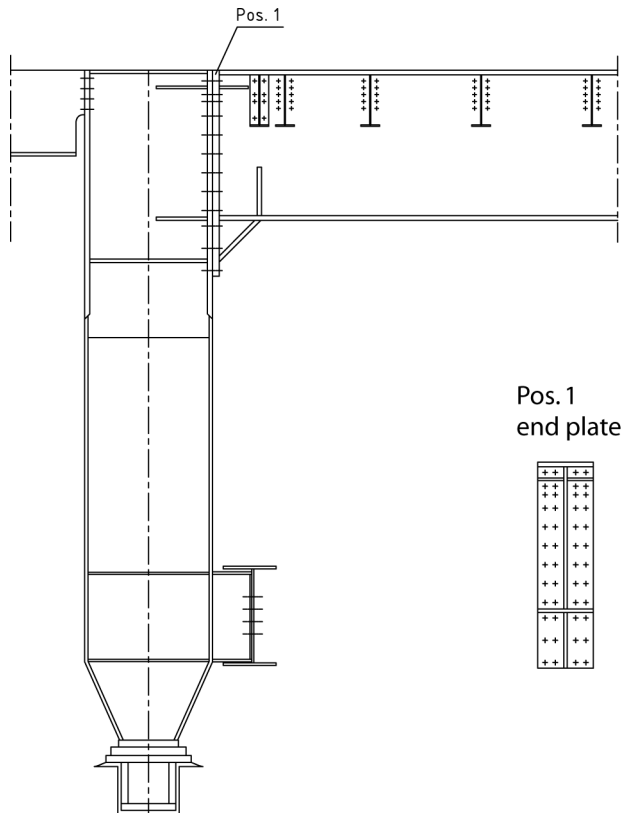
End plate (pos. 1) of the bolted beam-column-connection of a steel frame made of S235, $t = 80$ mm
